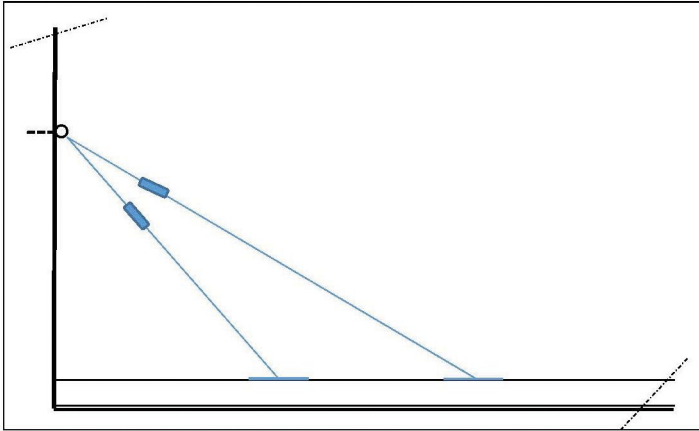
Scheme of the solution adopted using wall as point of anchorage for cables. The anchorage is performed using a long rawl plug embedded in the wall section.
